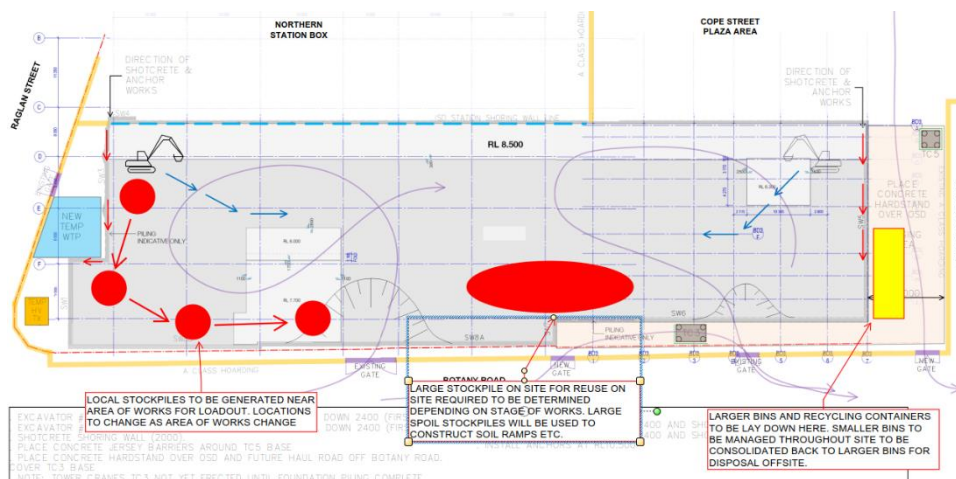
Example of Site Stockpile Arrangement during CC1 works
